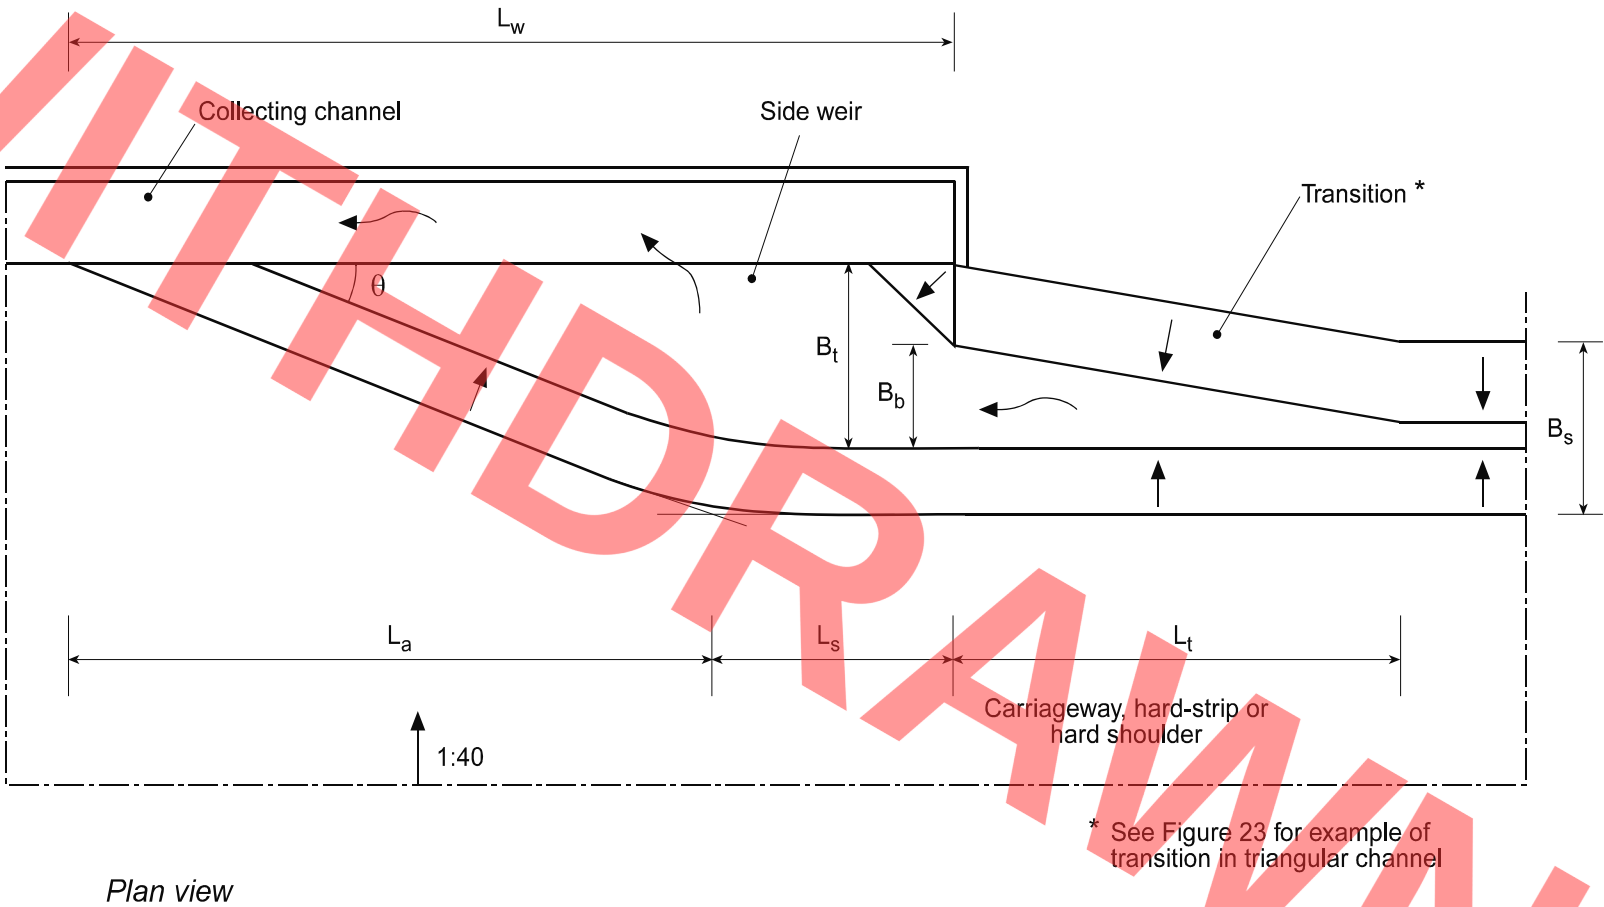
Diagrammatic layout of weir outlet and upstream transition
